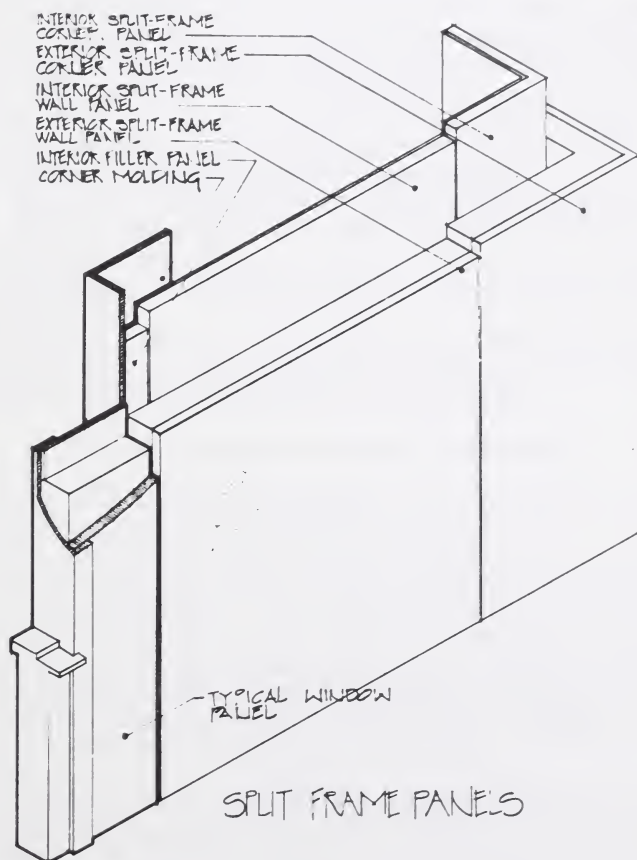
Schematic showing split frame wall panels and how they are assembled. The window and door panels for the second-generation house are not split frame, but a special molding provides for transfer from split panels to single panels.
